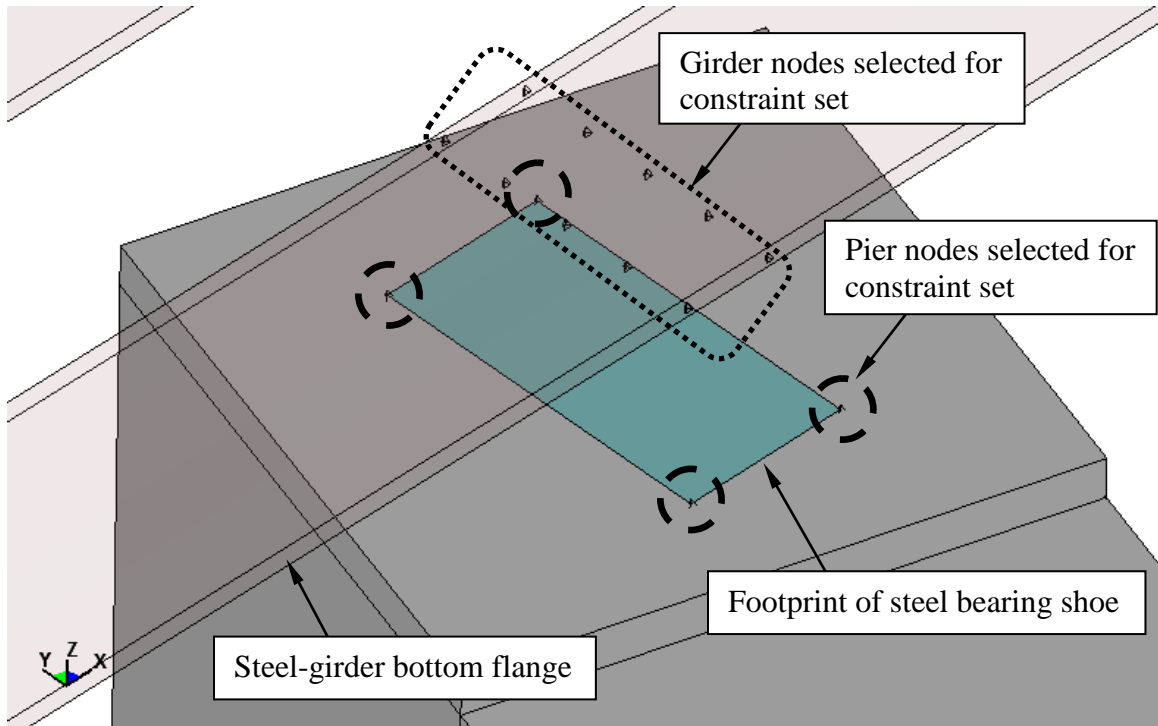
Isometric view of southernmost bearing pedestal atop pier cap of central pier (mesh not shown).
